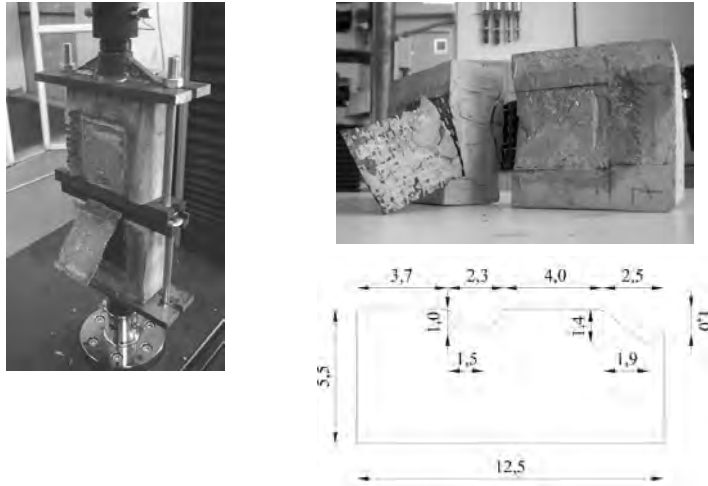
Failure mode of bricks reinforced with CFRP strips subjected to delamination tests.
